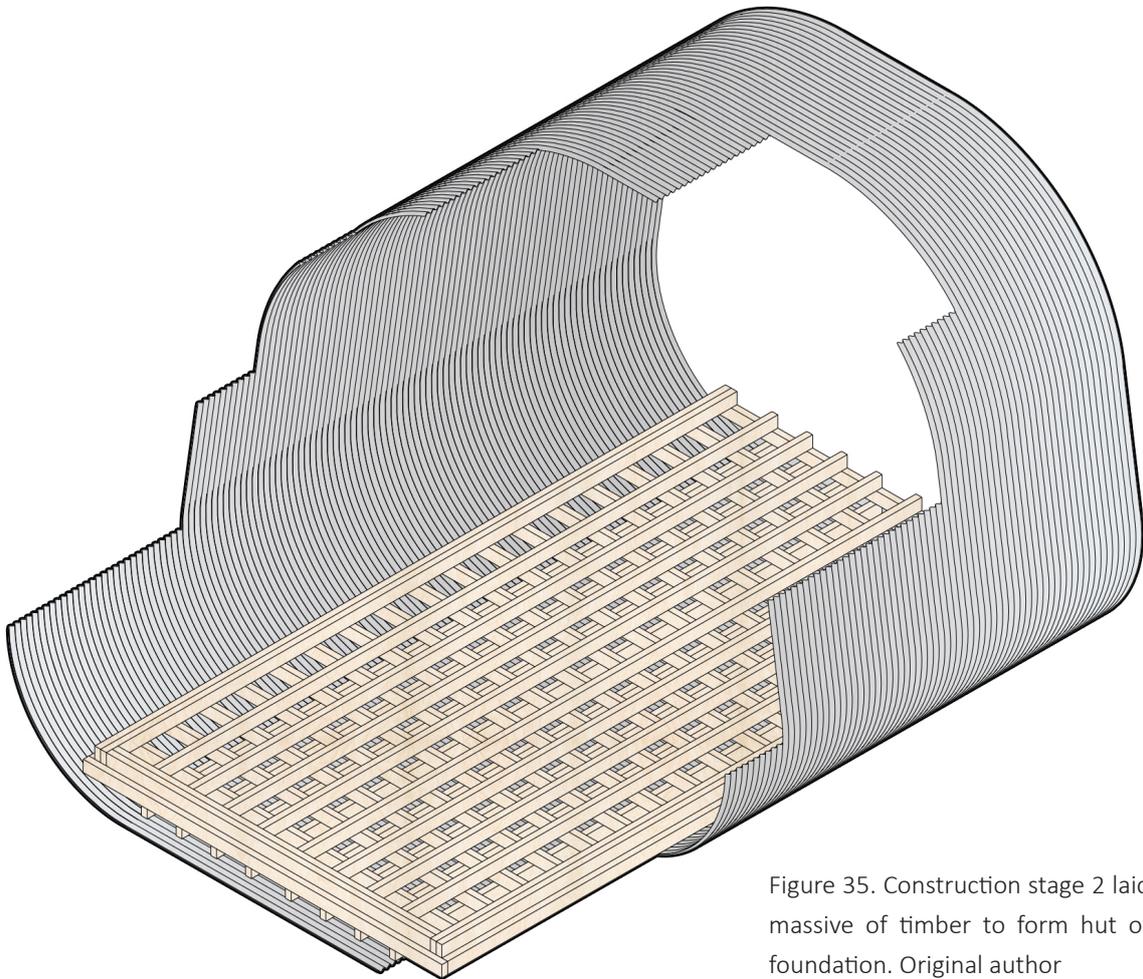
Construction stage 2 laid massive of timber to form hut of foundation. Original author
